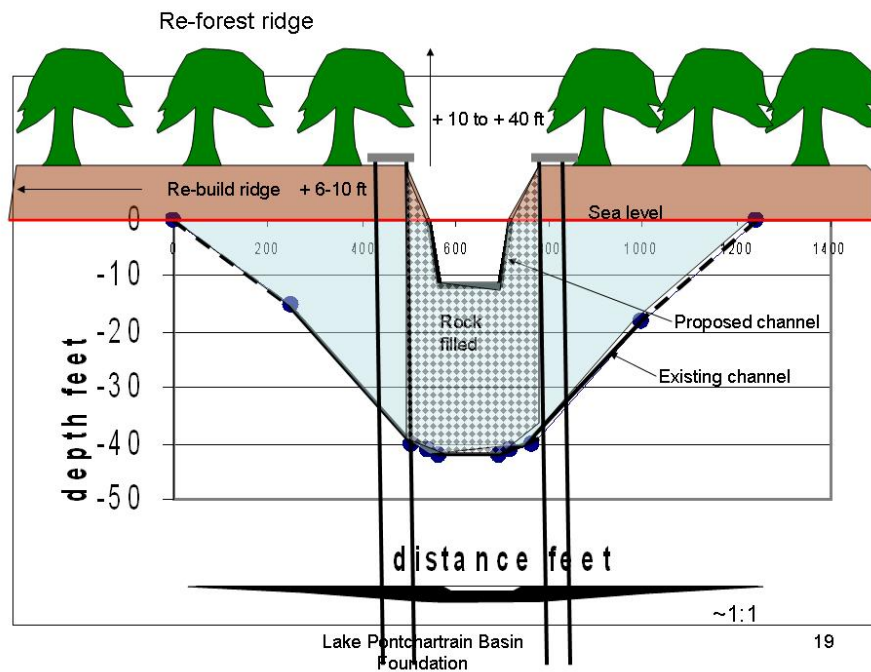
Channel profile of the existing MRGO at Bayou la Loutre Ridge and proposed channel modifications to constrict the cross-sectional area of the channel.
